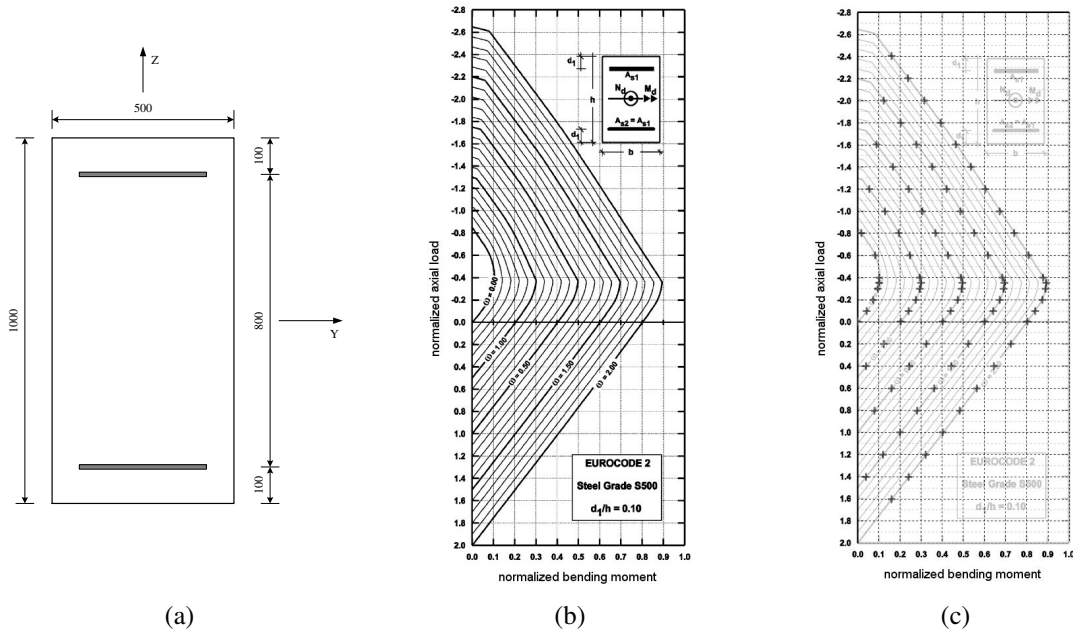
(a) Rectangular reinforced concrete cross section (distances in mm)
